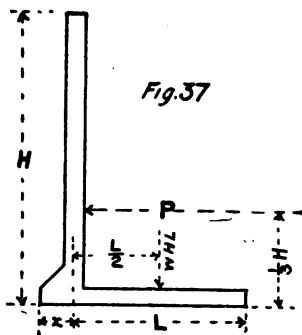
shows a section of wall assumed to be one foot long. There is a strip of filling one foot thick back of it tending to overturn it, and the overturning moment at the toe A must be resisted by the weight of the earth on the bottom slab. None of the earth tending to overturn the wall rests on the bottom slab and the parallelogram of earth on the slab is considered as the wall. The reinforced concrete wall in front merely retains the earth wall in place.
